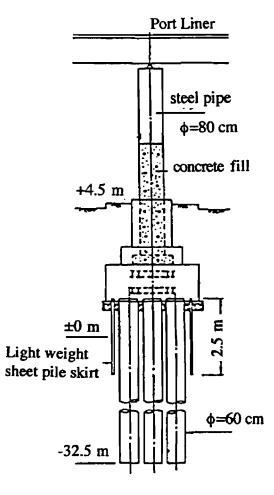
Pile foundation of the elevated Portliner Railway on Port Island (Watanabe, 1981)
